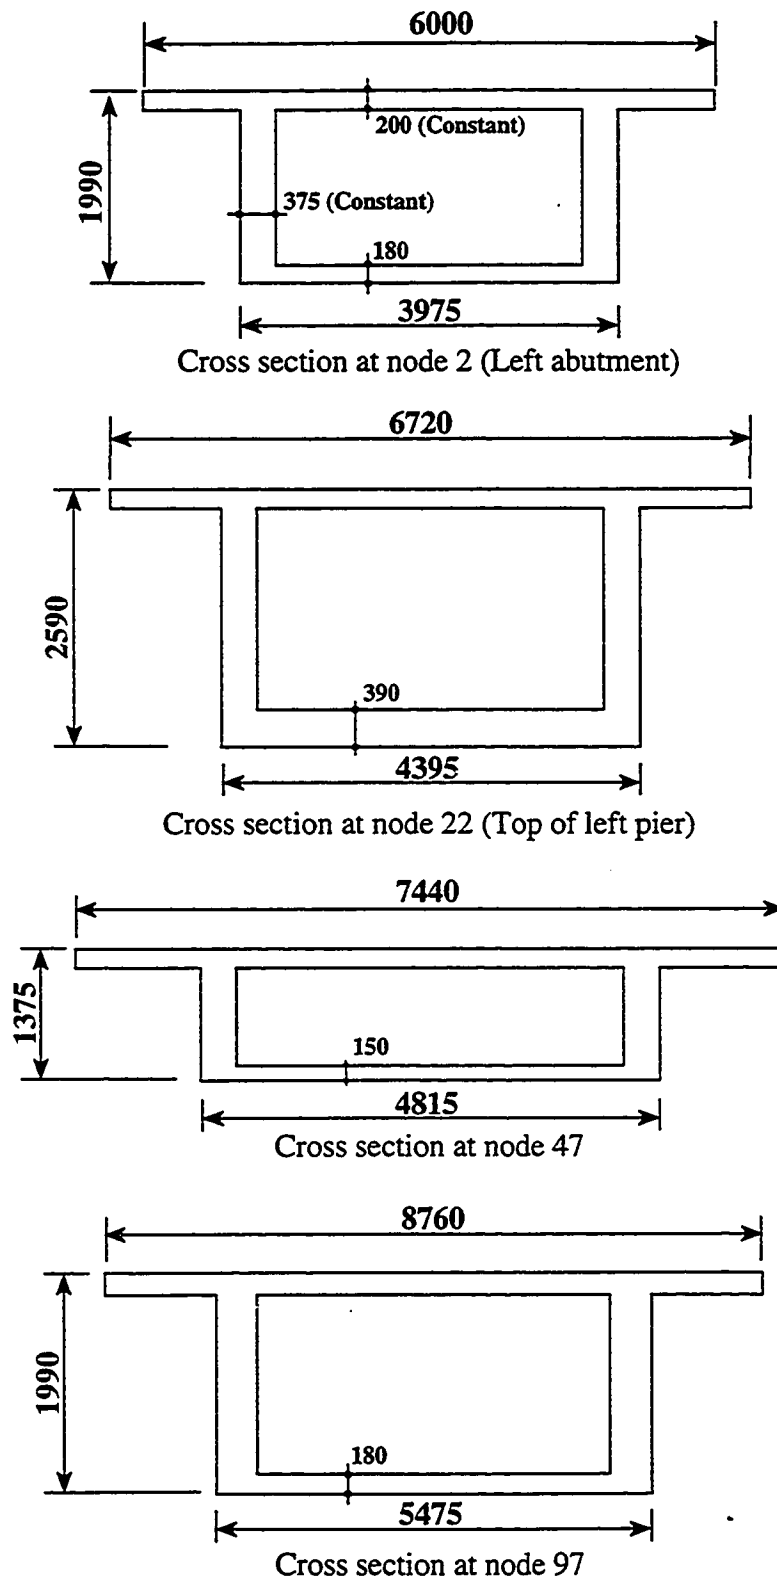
Cross Sectional Dimensions for Bridge used in Demonstration Example
